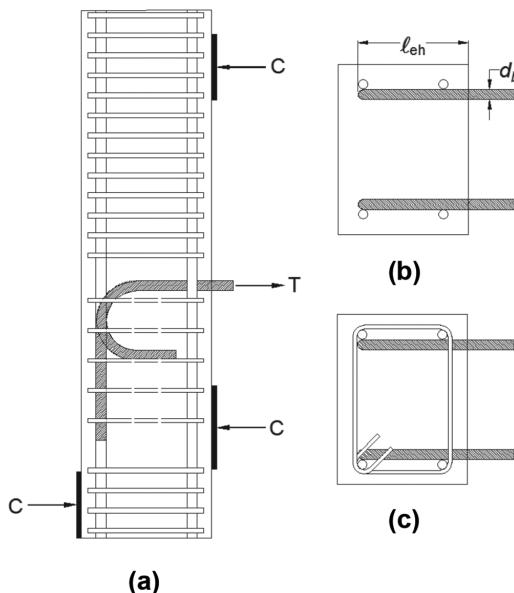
Simulated beam-column specimens: (a) side view; (b) cross section without confining reinforcement; and (c) cross section of specimen with confining reinforcement parallel to straight portion of hooked bar (Sperry et al. 2017a).
